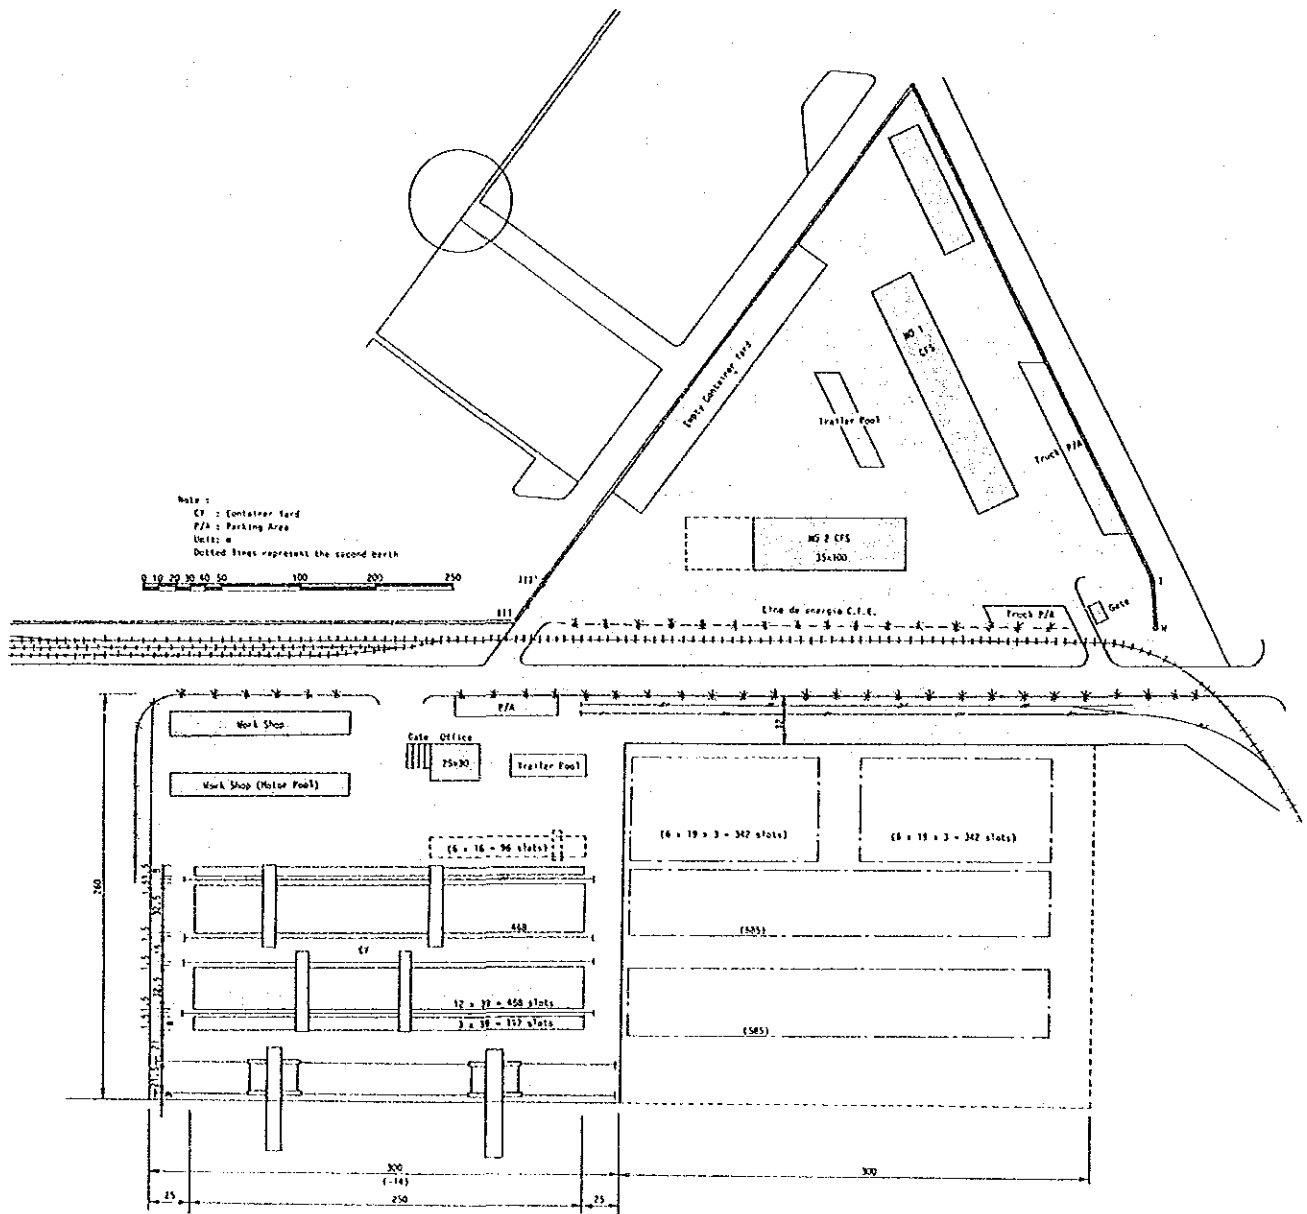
Layout Plan of New Container Terminal - Rail Mounted Transfer Crane System
